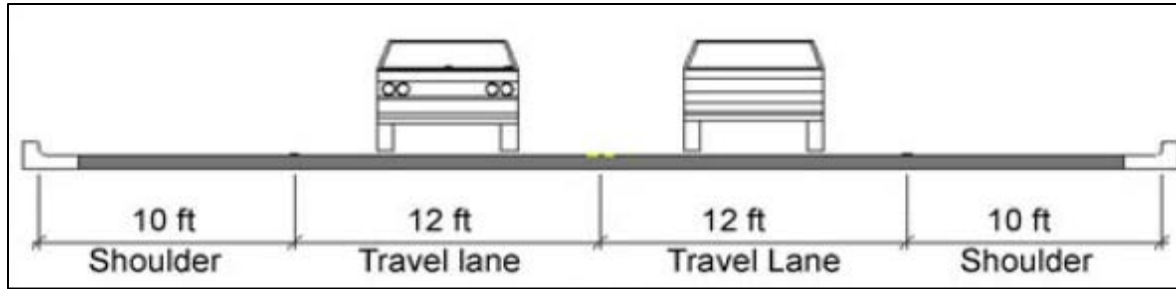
West 110th Street Cross-Section Featuring 10 Feet Parking Lanes
